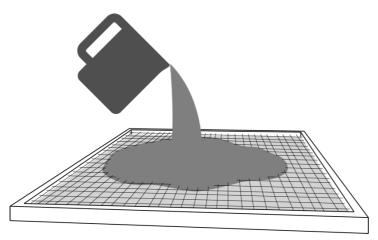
With a formwork with fixed or loose reinforcement the concrete is casted. (Illustration: Ellen Simonsson)
